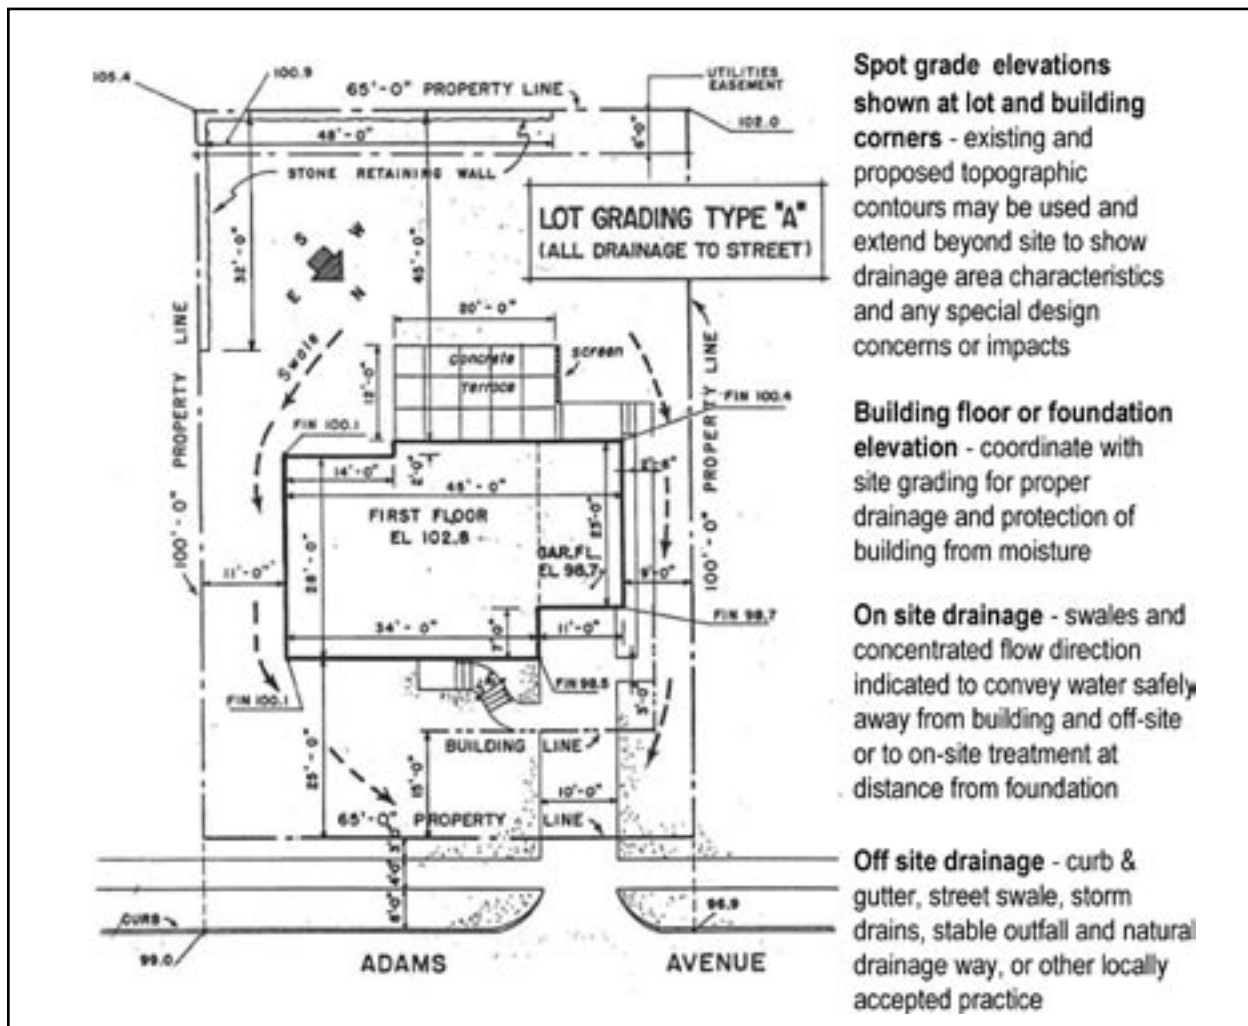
Site Drainage Plan Considerations (Single Lot)
